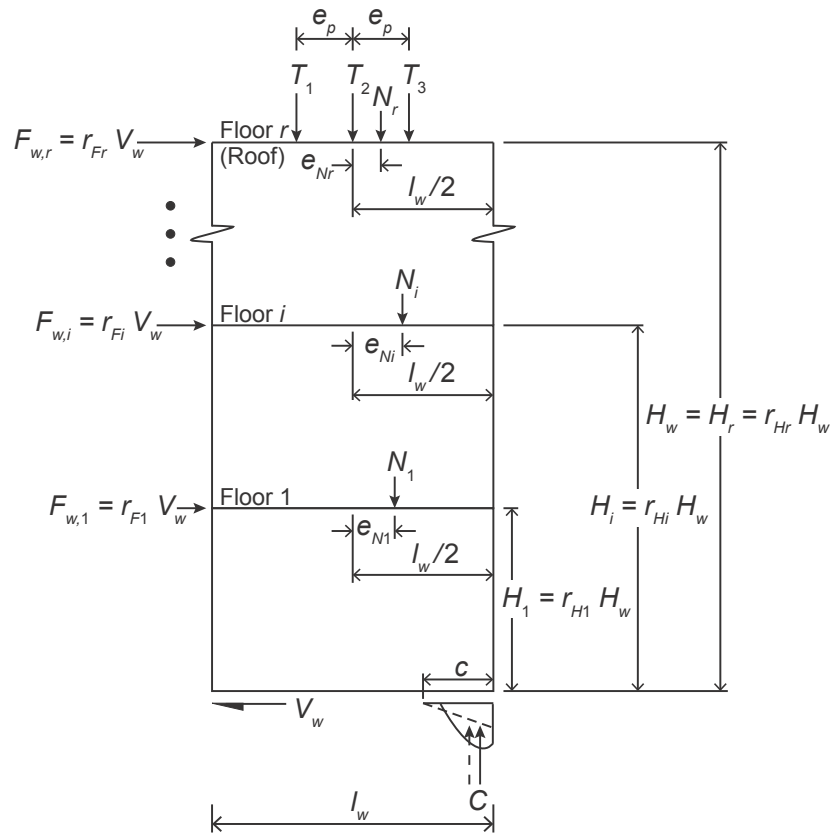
Forces on an unbonded post-tensioned precast concrete wall. Note: c = contact length at wall base; C = concrete compression stress resultant at wall base; e_{Ni} = eccentricity of N_i measured from the wall centerline; e_{Nr} = eccentricity of N_r measured from the wall centerline; e_p = eccentricity of post-tensioning steel from wall centerline to centroid of post-tensioning steel group; $F_{w,i}$ = lateral force on wall at floor i ; $F_{w,r}$ = lateral force on wall at roof level; H_i = height of floor level i measured from the base of the wall; H_r = height of roof level measured from the base of the wall = H_w ; H_w = total wall height; l_w = wall length; N_i = gravity load at i th floor level, including panel self-weight; N_r = gravity load at roof level, excluding top panel self-weight; r = total number of stories in a wall; r_{Fi} = ratio of the force in the i th floor level to the wall base shear; r_{Fr} = ratio of the force at the roof level to the wall base shear; r_{Hi} = ratio of the i th floor height to the total height of the wall; r_{Hr} = ratio of the roof height to the total height of the wall (equal to unity); T_1 = total force in post-tensioning steel group 1; T_2 = total force in post-tensioning steel group 2; T_3 = total force in post-tensioning steel group 3; V_w = wall base shear (equal to sum of applied lateral loads).
